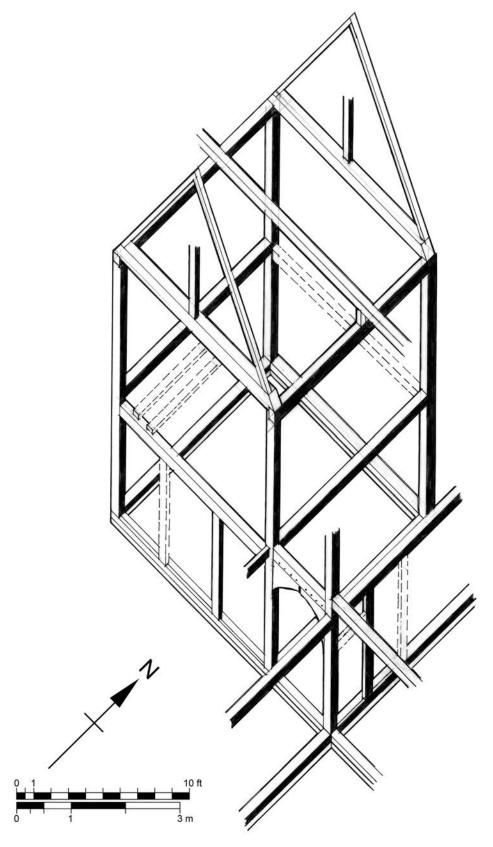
Isometric view of the rear, single-bay building at The Goat and Boot, 70 East Hill (corpus no. 15)
